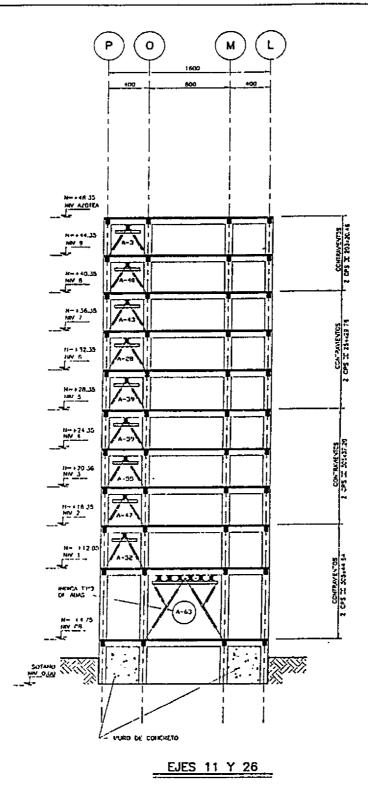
Typical Bracing Arrangement IMSS Reforma Building
